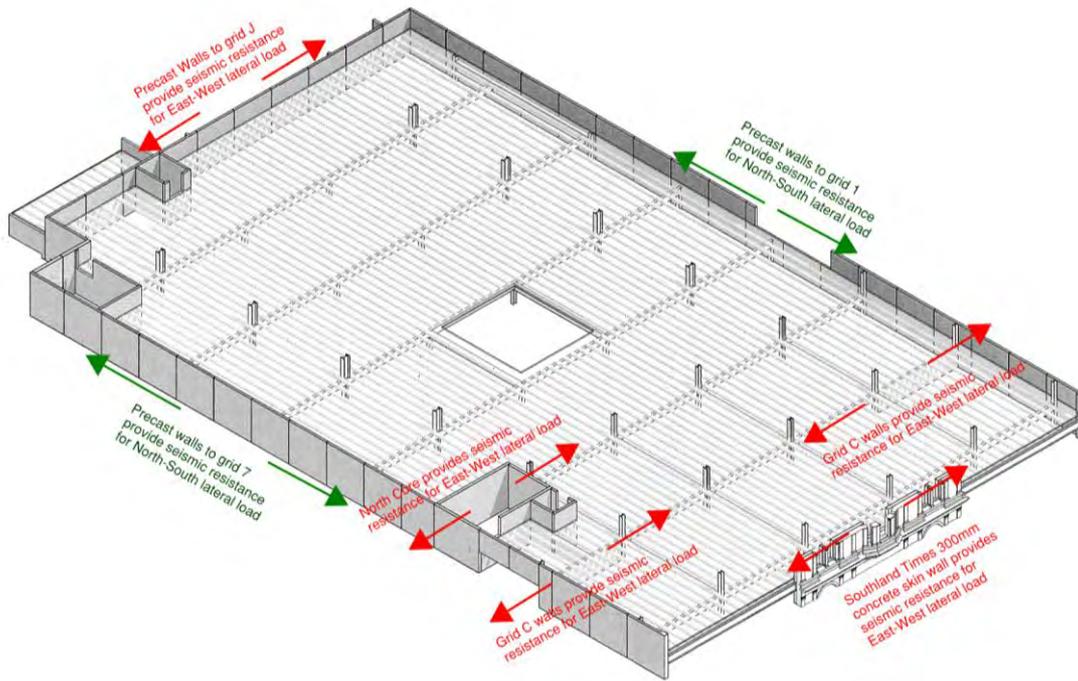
Lateral Load Resisting Elements Ground Floor to Level 1
